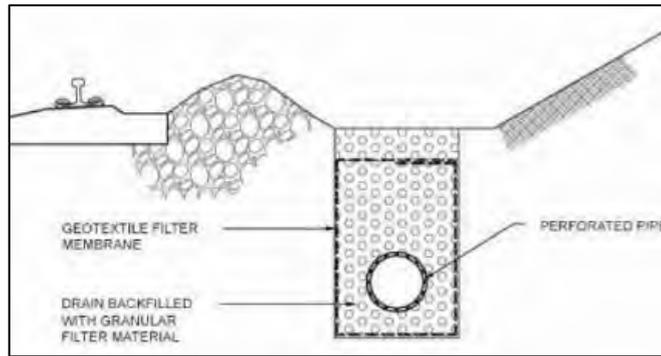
Typical piped cess collector drain, source Network Rail (2010)
